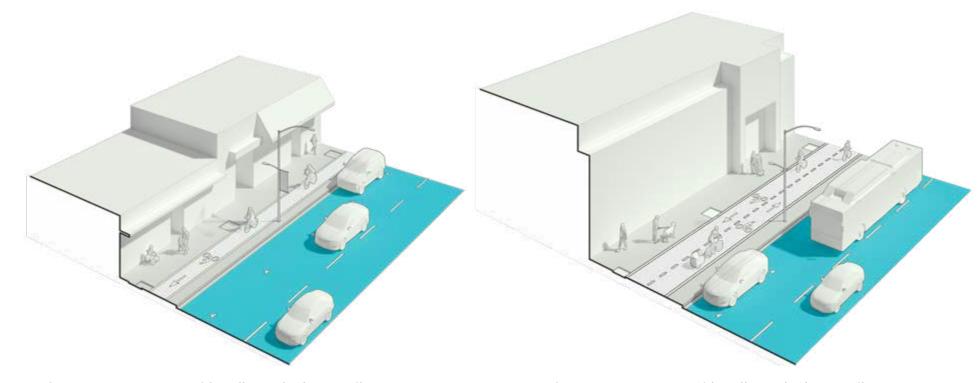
One-Way, Sidewalk-Level, Class IV Bikeway.
